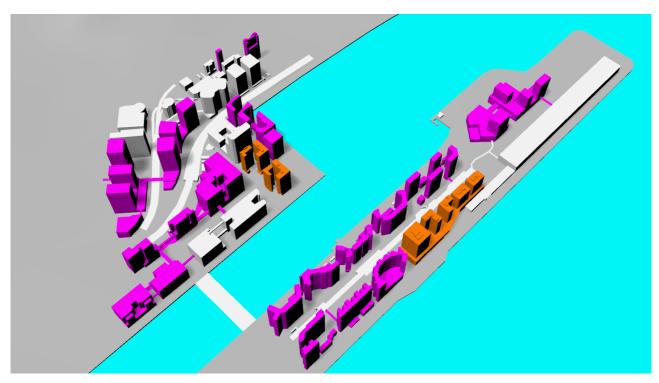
Westerly view of Surrounding Building under Proposed Scheme
